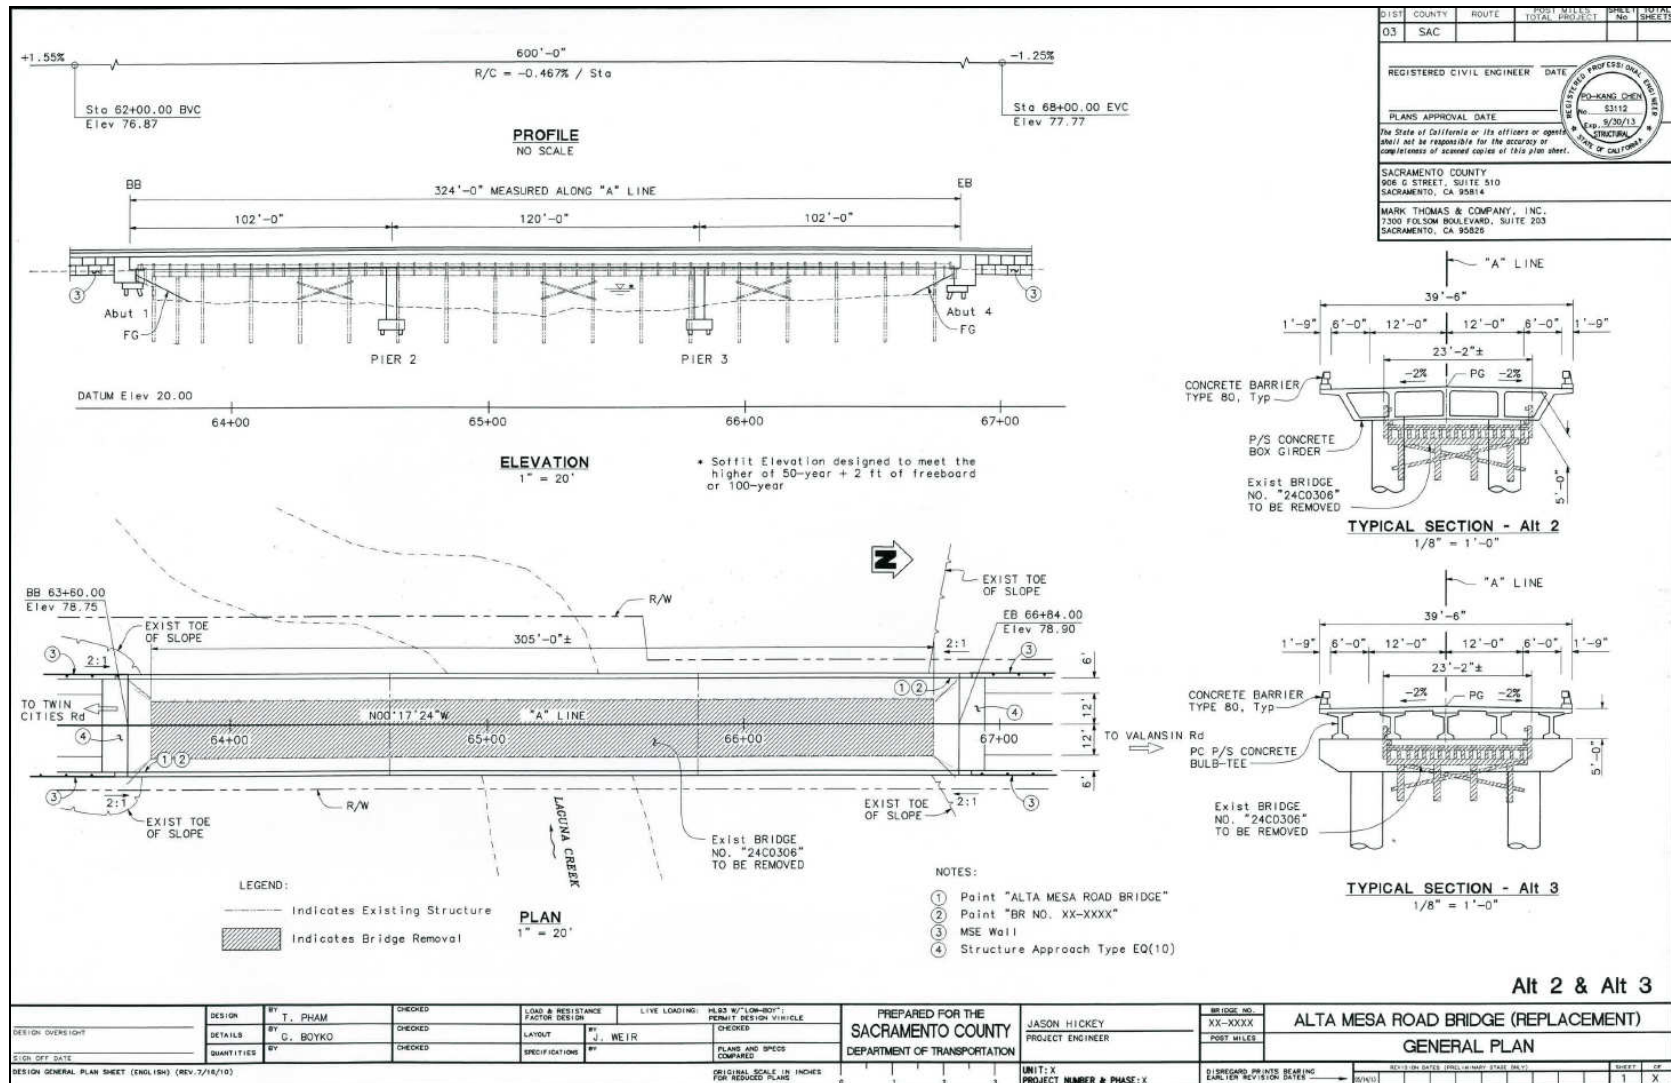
Proposed Alta Mesa Road Bridge Replacement General Plan
